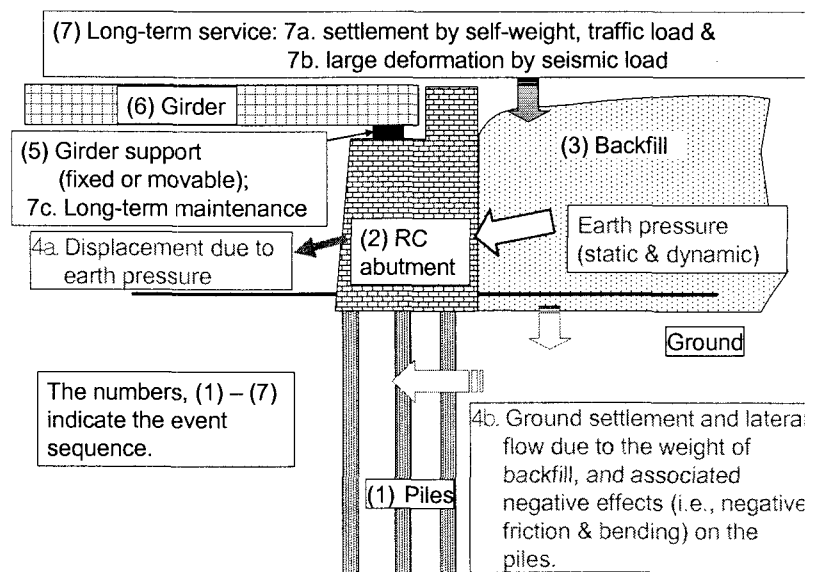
Construction sequence and technical problems with conventional type bridge abutments.
